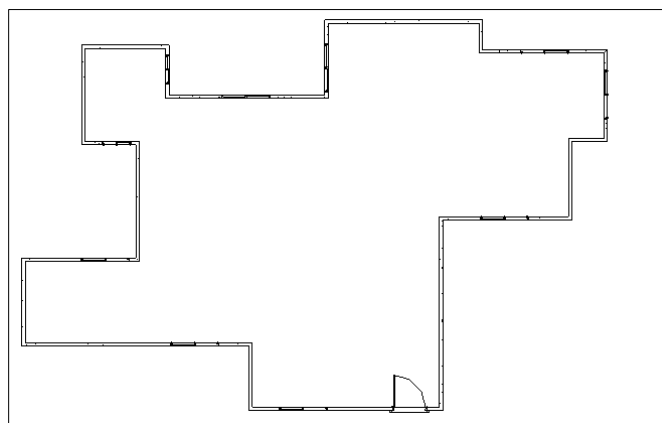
Author's drawing of the exterior walls for layout generation in PlanFinder
